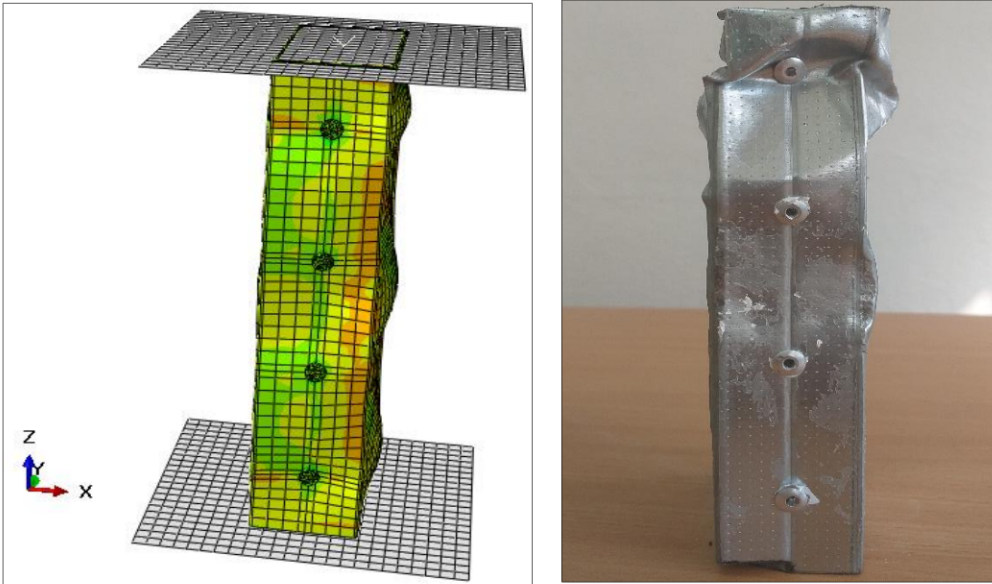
Failure mode of cold-formed steel built-up face-to-face filled with concrete column: (a) Numerical; (b) Experimental.
